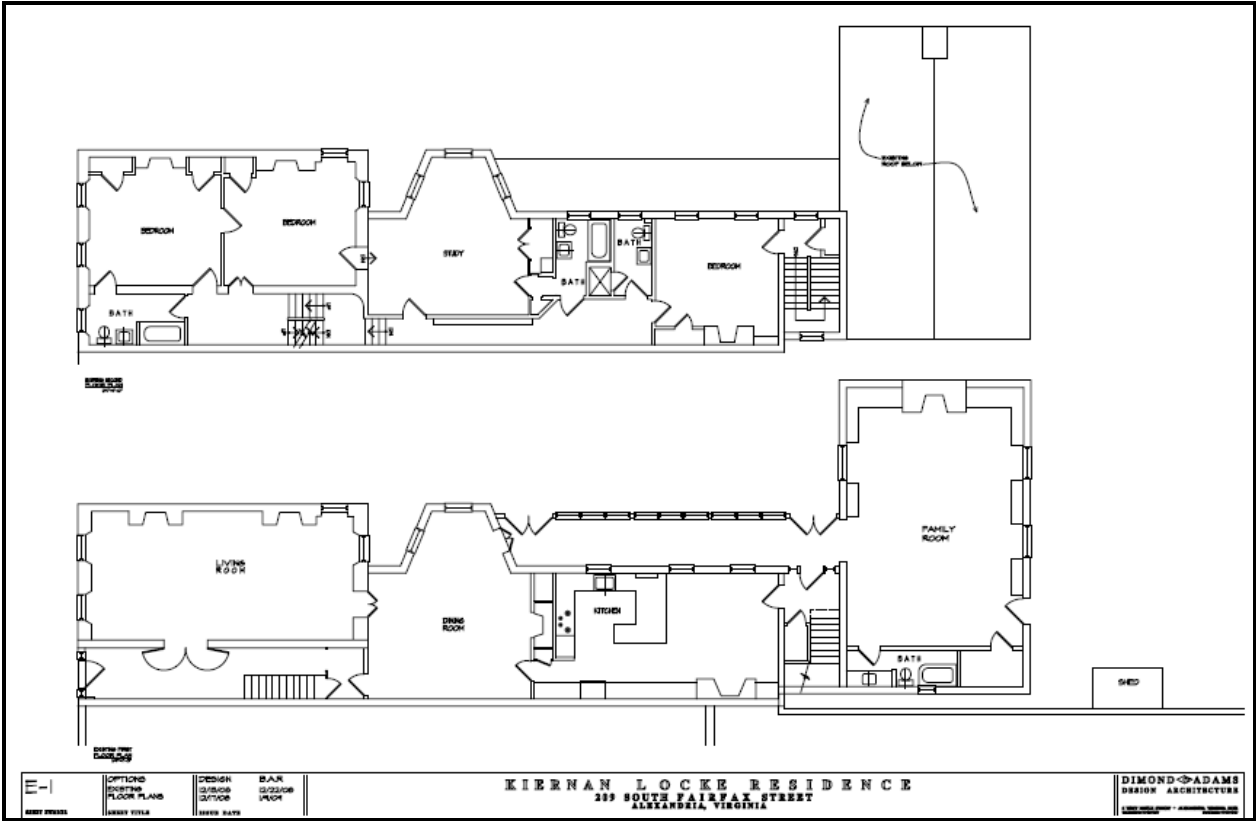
Existing Floor Plan - 1st & 2nd Floor
